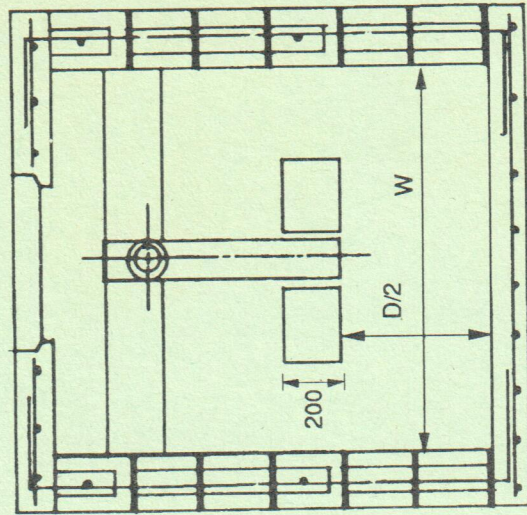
A DETAILS OF REINFORCED CONCRETE SEPTIC TANK
